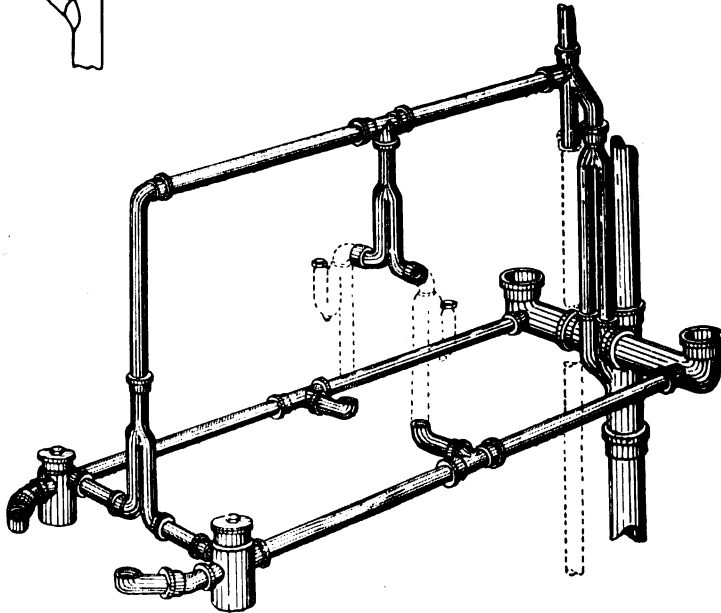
Roughing-in for Adjacent Toilet-Rooms on Same Floor of Double-Flat Building.
